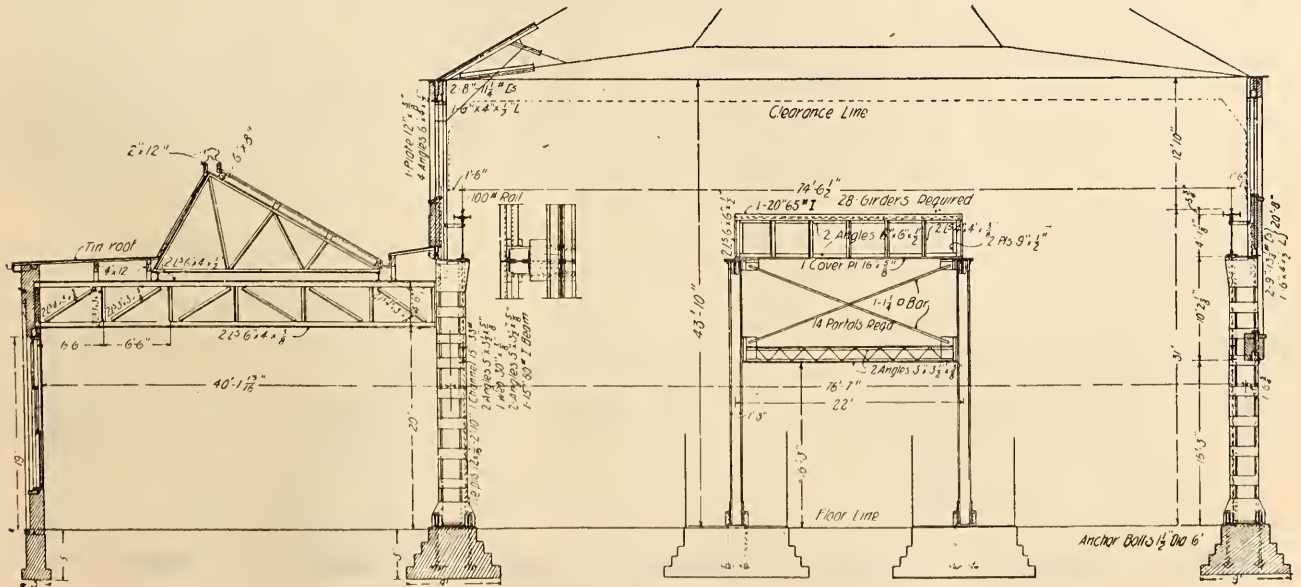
CROSS SECTION OF MACHINE AND ERECTING SHOP—C. & E. I. R. R.
